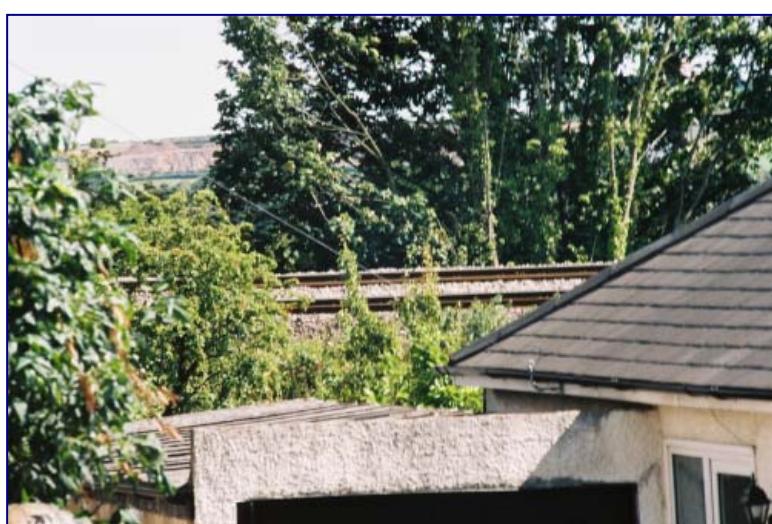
Bridgend College Station Site Cowbridge Road Bridge
